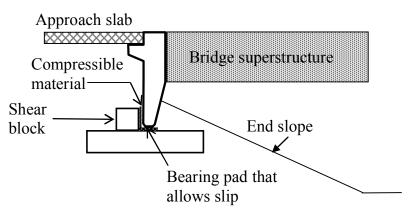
Schematic. "Diaphragm-on-footing" type integral abutment on spread footing in an end slope used by Nevada Department of Transportation.
